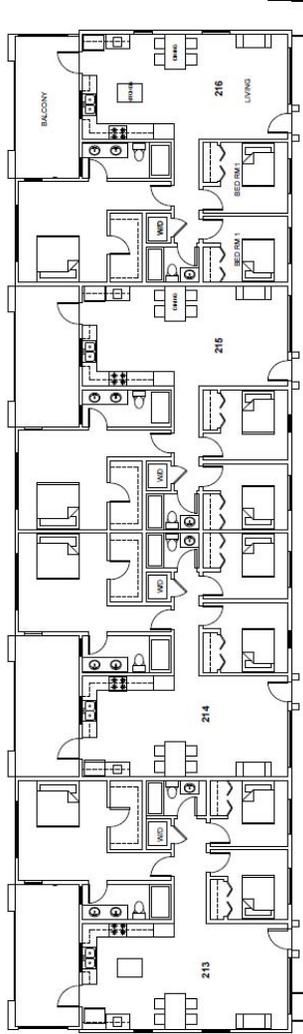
UNITS 13-17 (18-21) FLOOR PLAN
